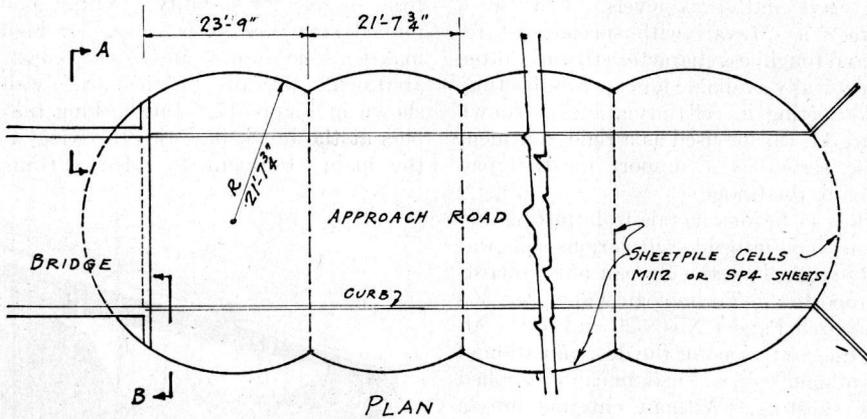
Steel Sheetpiling Filled Cell Abutment Apalachicola Bay Bridge. Designed by Florida State Road Department
